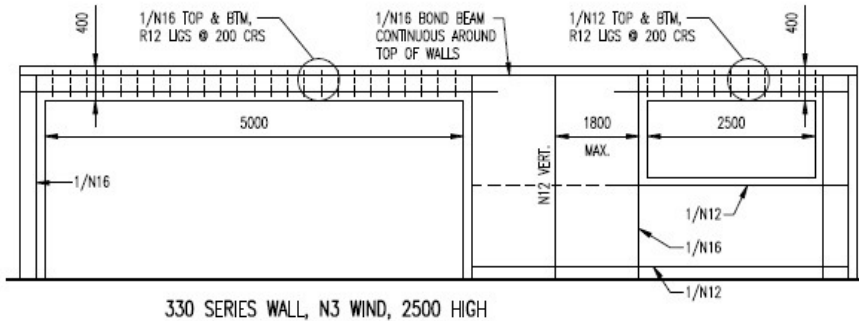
2500 High Wall, N3 Wind Rating, 330 Series ECO-Block (Max. roof load width: 9.6m)
